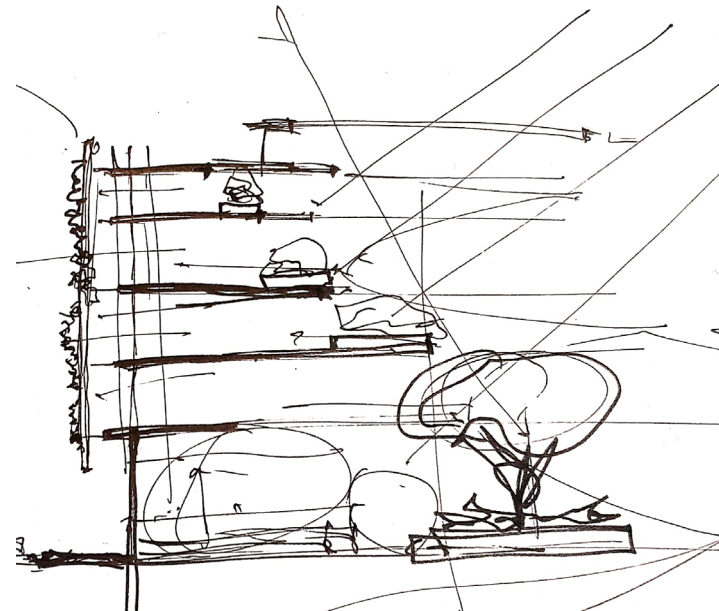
EARLY VOID CONCEPT (AUTHOR 2021)
